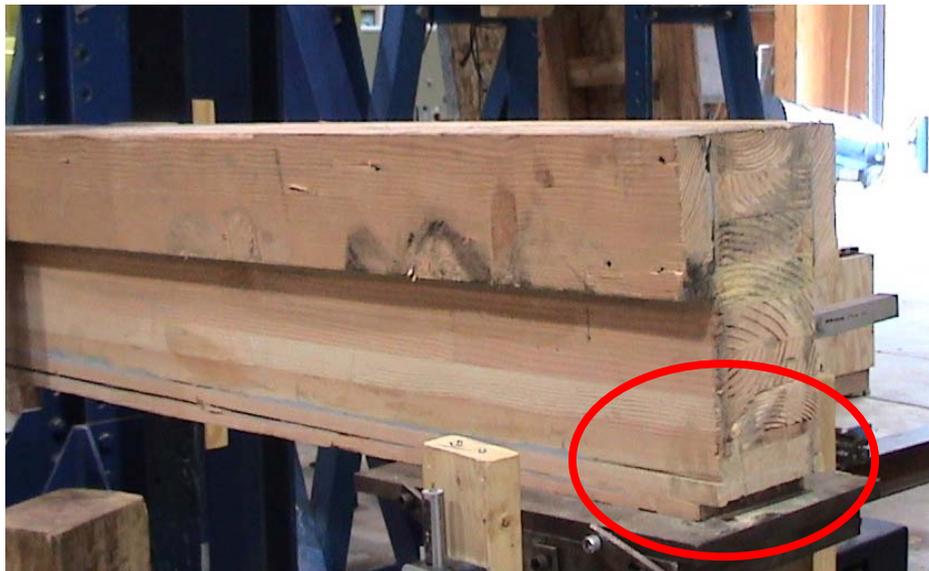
R-5 horizontal shear failure between the steel reinforcement and the wood directly above it from the load head to the right beam support. Note bottom half of reinforcement lamination pulled toward load head.
